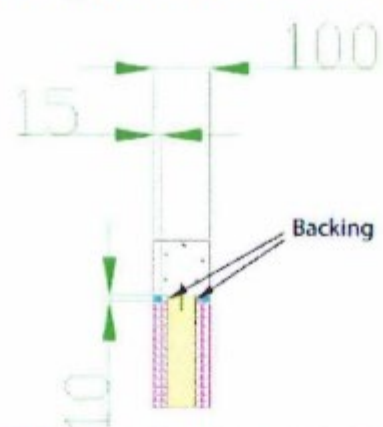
wall gypsum to stone thickness ≥ 100 mm
